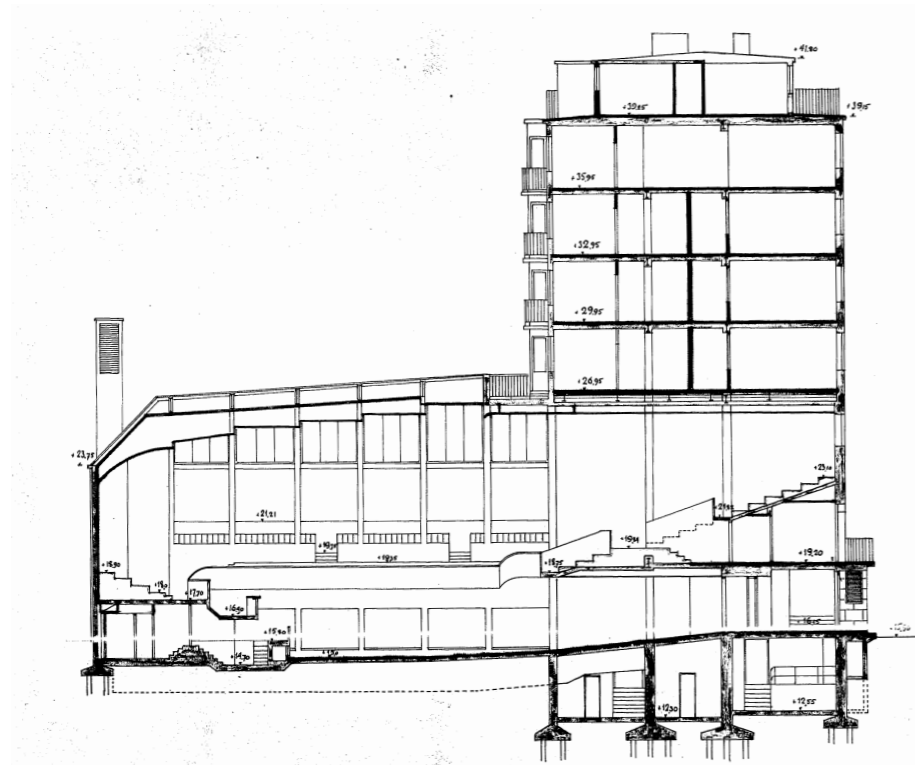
North-south section. Original drawing (1940) (Göteborgs Stad., n.d.)
